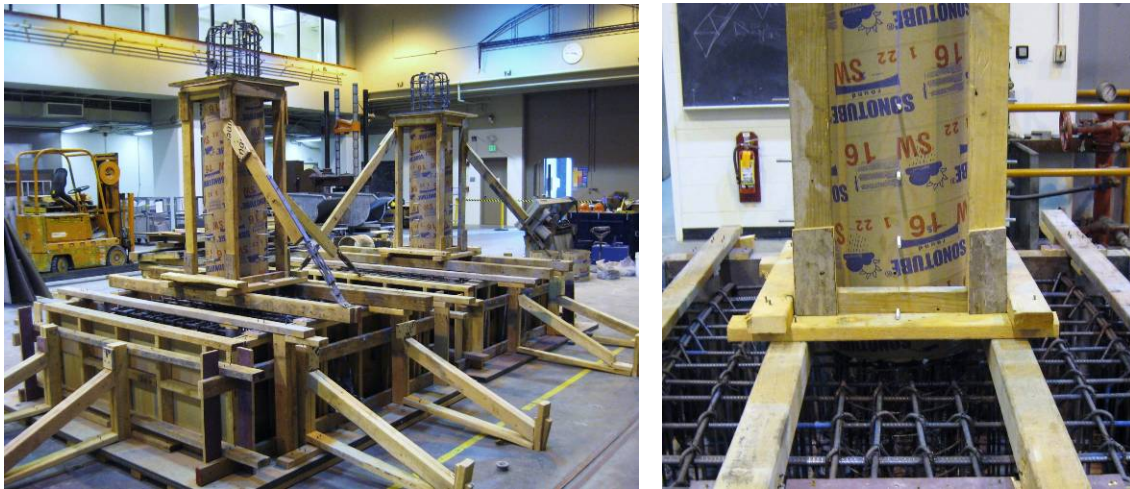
(a) Laterally-braced column formwork; (b) Detail of instrumentation rods in column base
